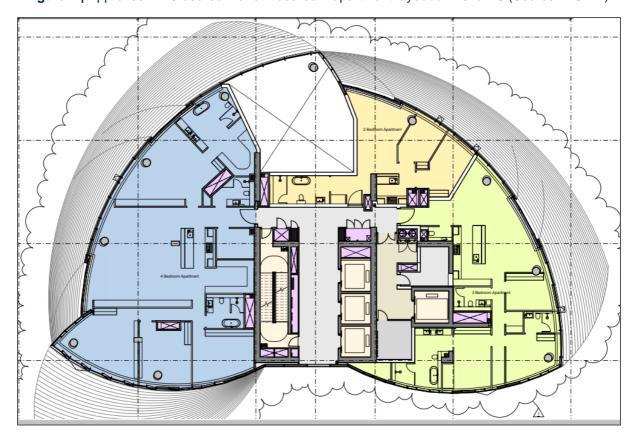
| Approved 2 bedroom, 3 bedroom and 4-bedroom apartment layout on Level 49 (Source: MOD 1)
